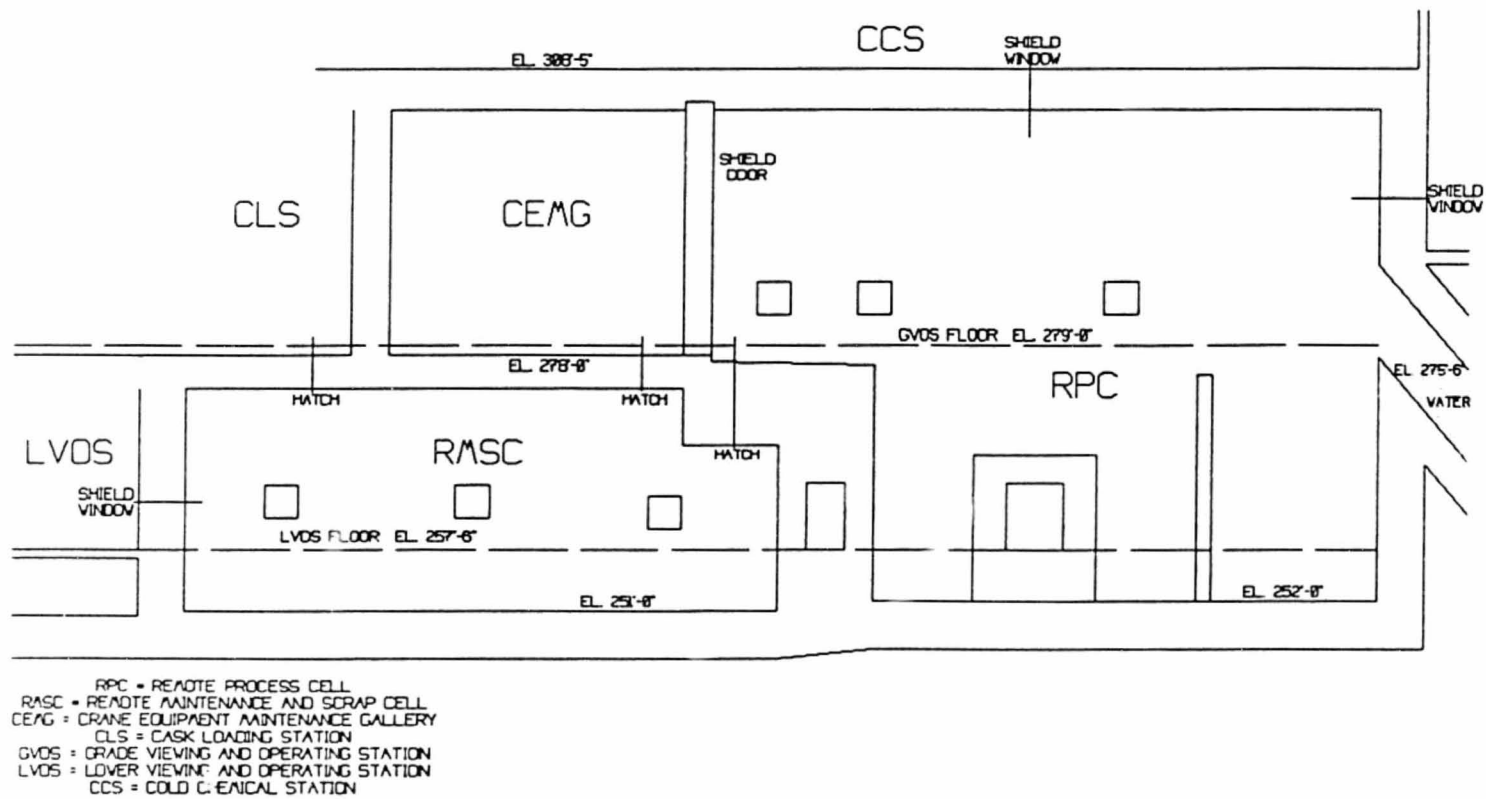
Elevation looking north in the Barnwell Plant fuel handling area.
